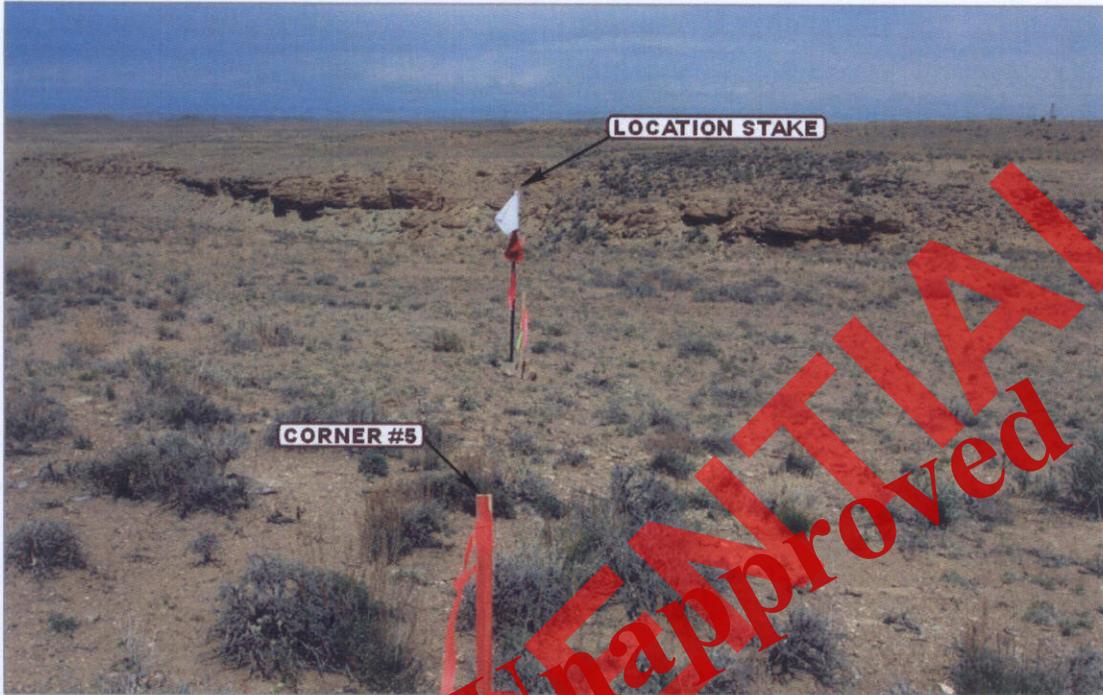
PHOTO: VIEW FROM CORNER #5 TO LOCATION STAKE
